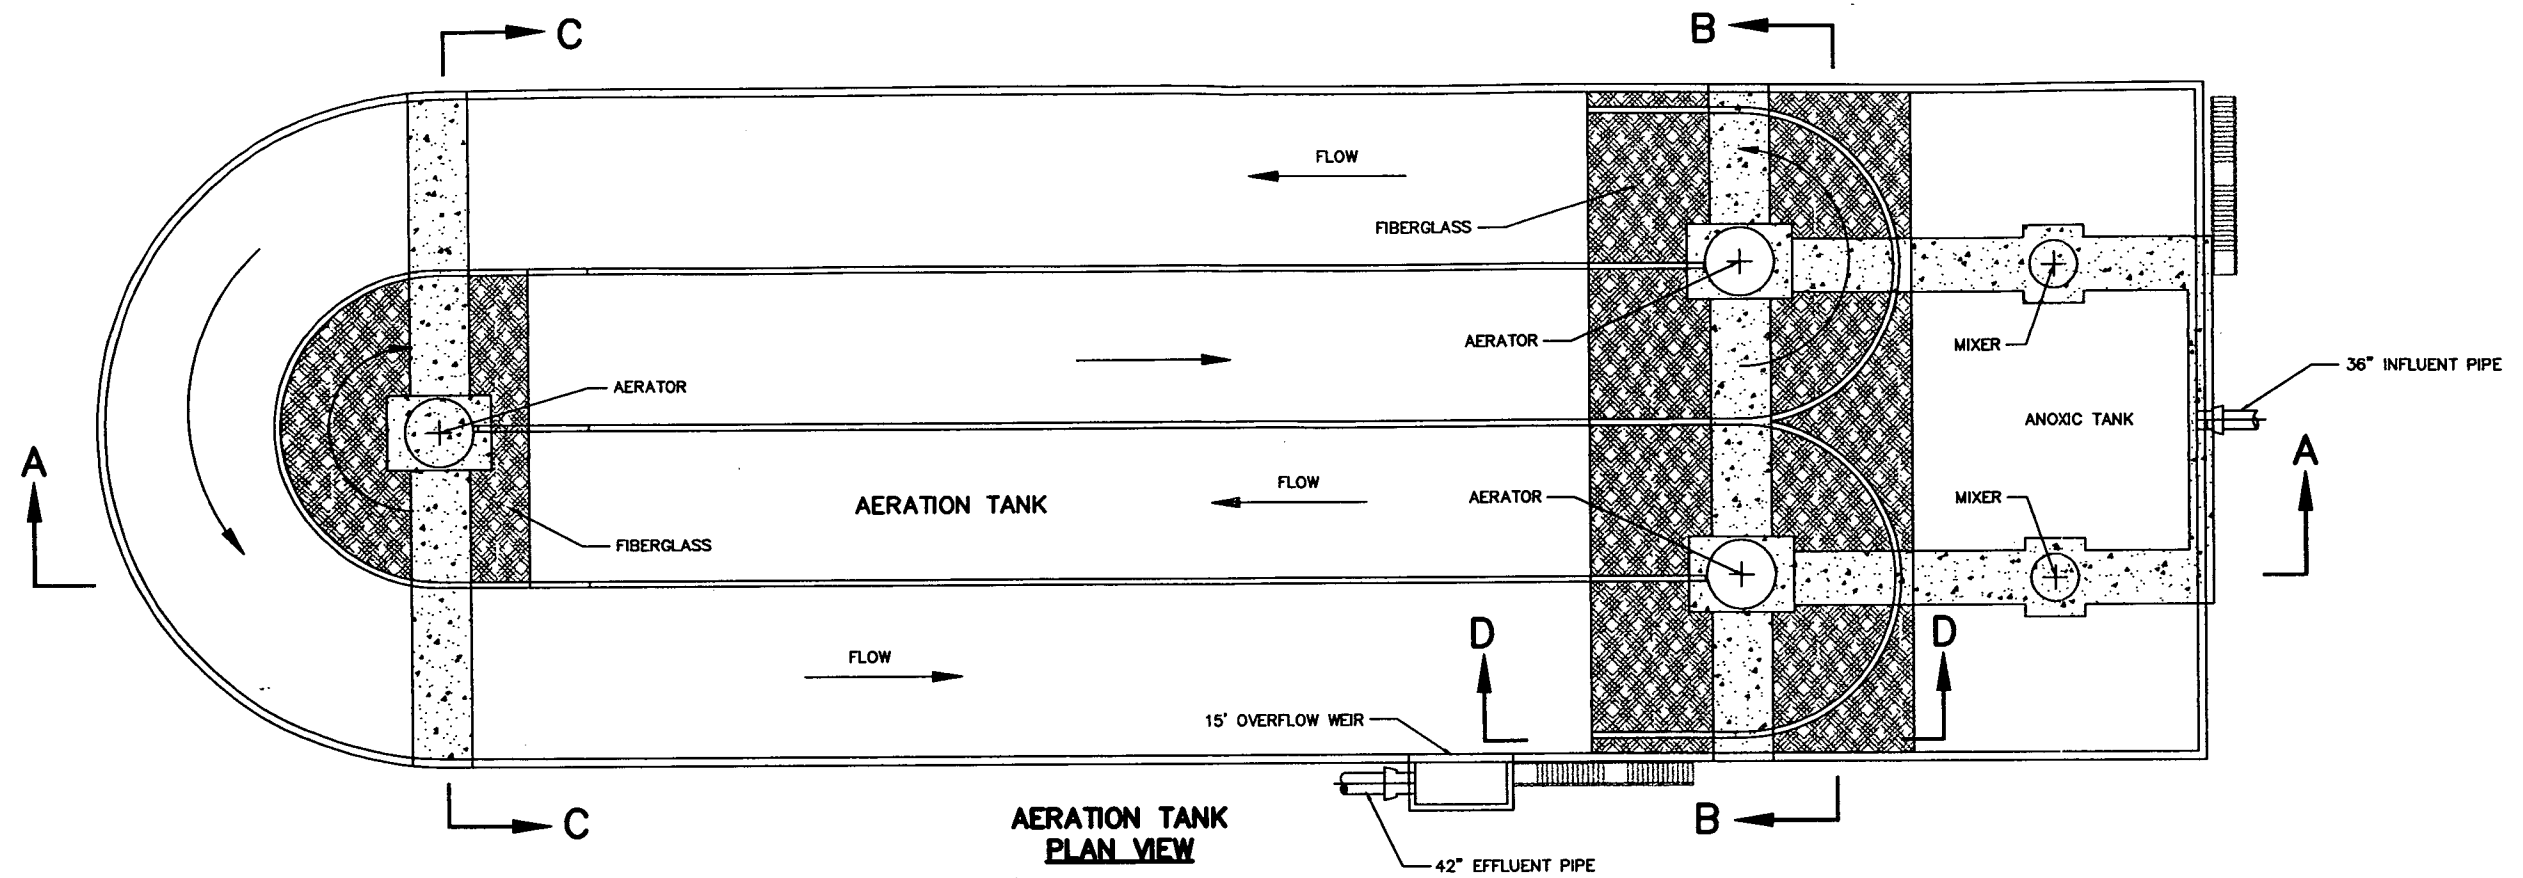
shows a plan view of the proposed layout of the new oxidation ditch and anoxic tank.
